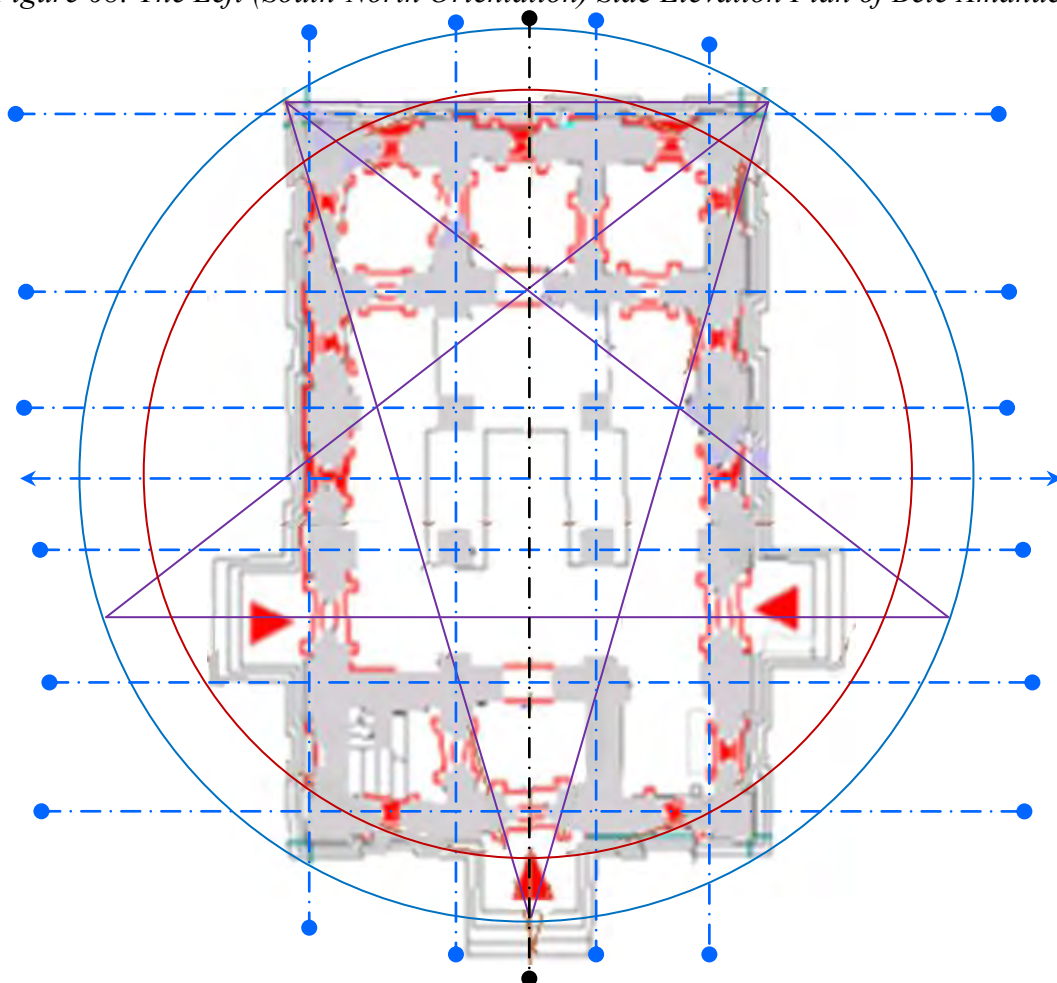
The Floor Plan of Bete Amanuel and under the geometrical configuration of golden proportioned pentagram, which is the top plan of icosahhedron.
